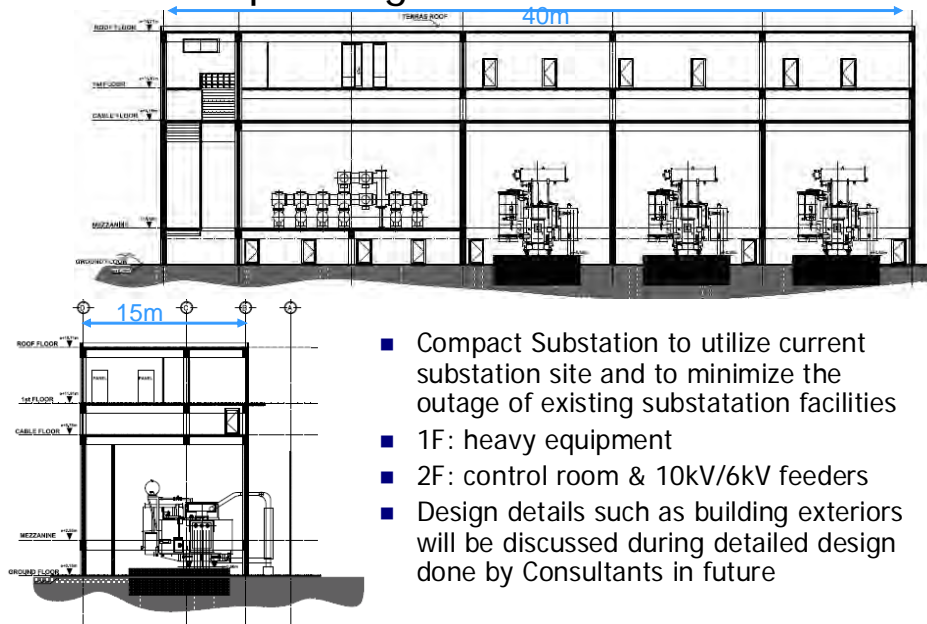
Preliminary Design of the Indoor Substation (Image)
